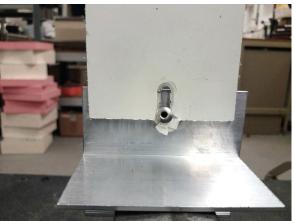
Example of pull through under shear using a rivet in the edge position (post-test).
